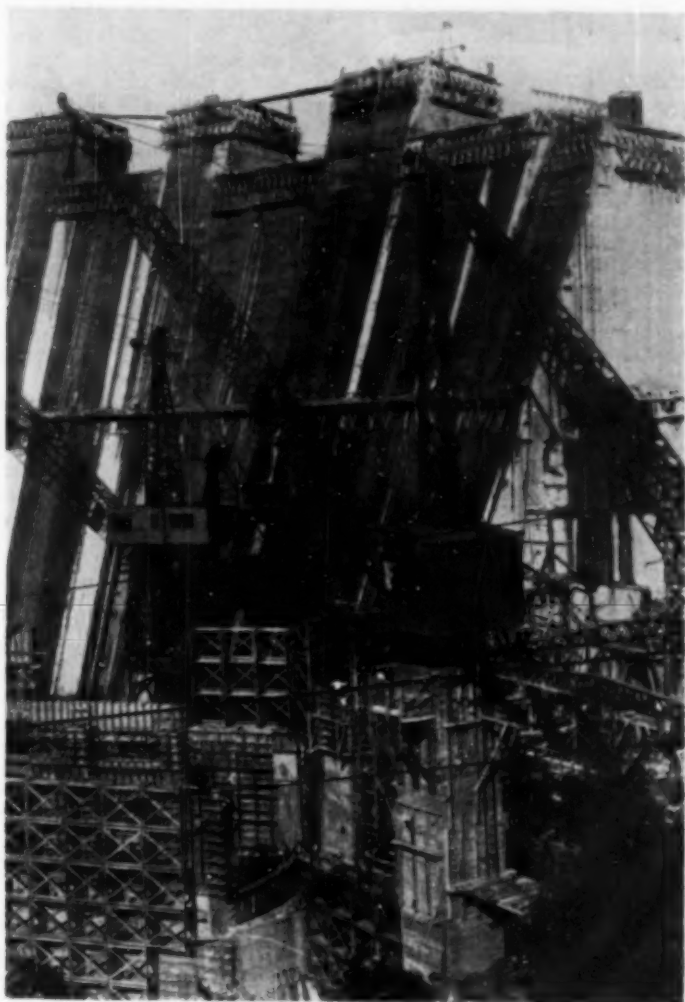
Tower and Derrick Cranes at Site of Dam.
